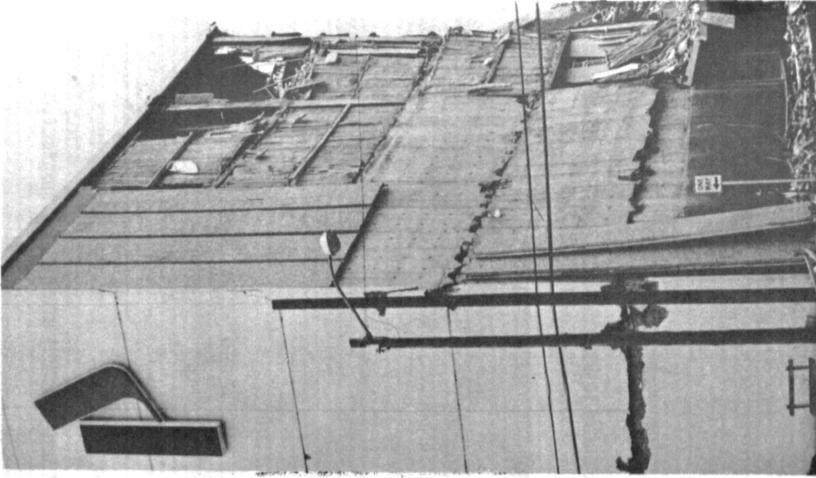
Penney Store, southeast corner. Wall on the right had been faced with 5" precast concrete panels which failed during the earthquake. Note wall offset at 2nd floor level.
